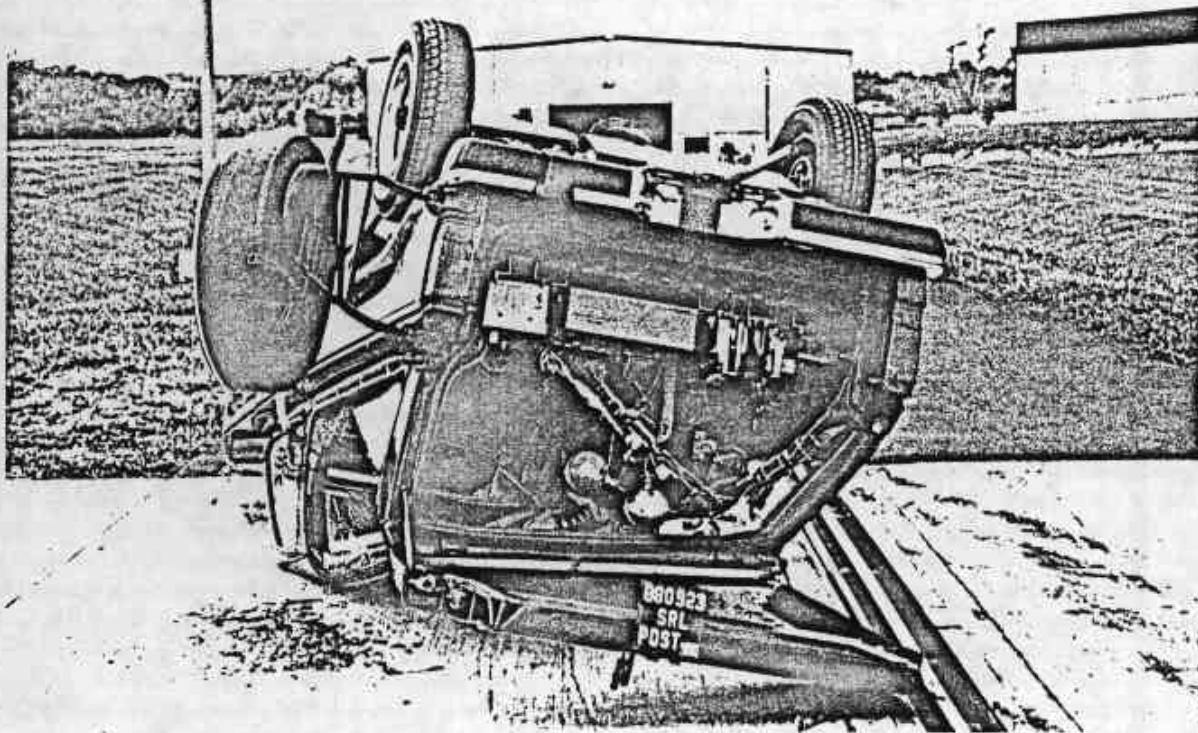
POST-TEST OVERALL REAR - VIEW 1
